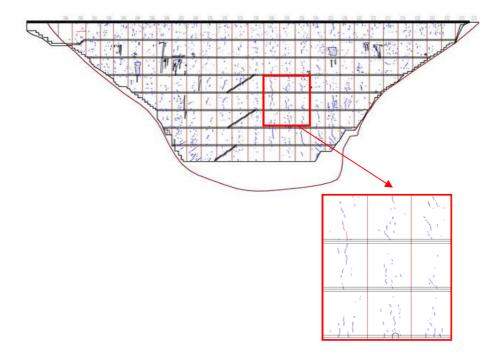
Crack map of the downstream face of the arch dam *Carte des fissures du parement aval du barrage-voûte* Red line: crack width larger than 0.5 mm
